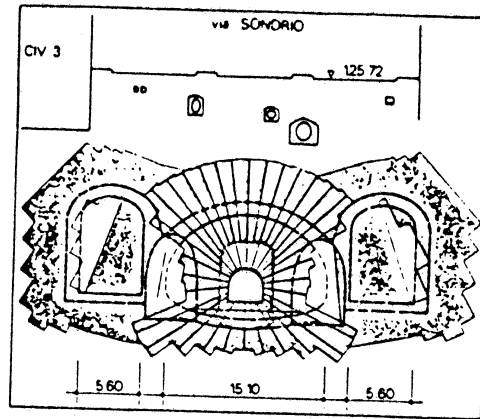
Treatment From Surface, to Protect Two Lateral Adits, Followed by Treatment From Central Pilot to Allow Excavation of Main Central Tunnel, Milano Metro.
